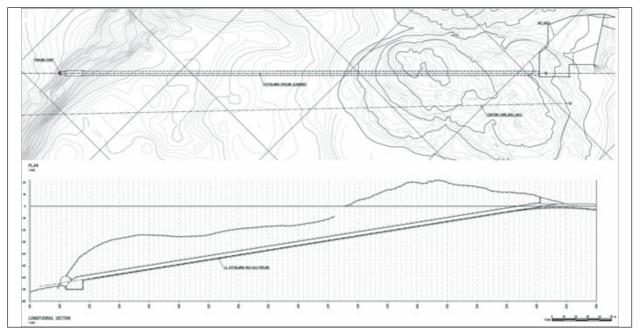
Longitudinal section and plan of landfall tunnel. (Illustration: Statoil / Norconsult)
